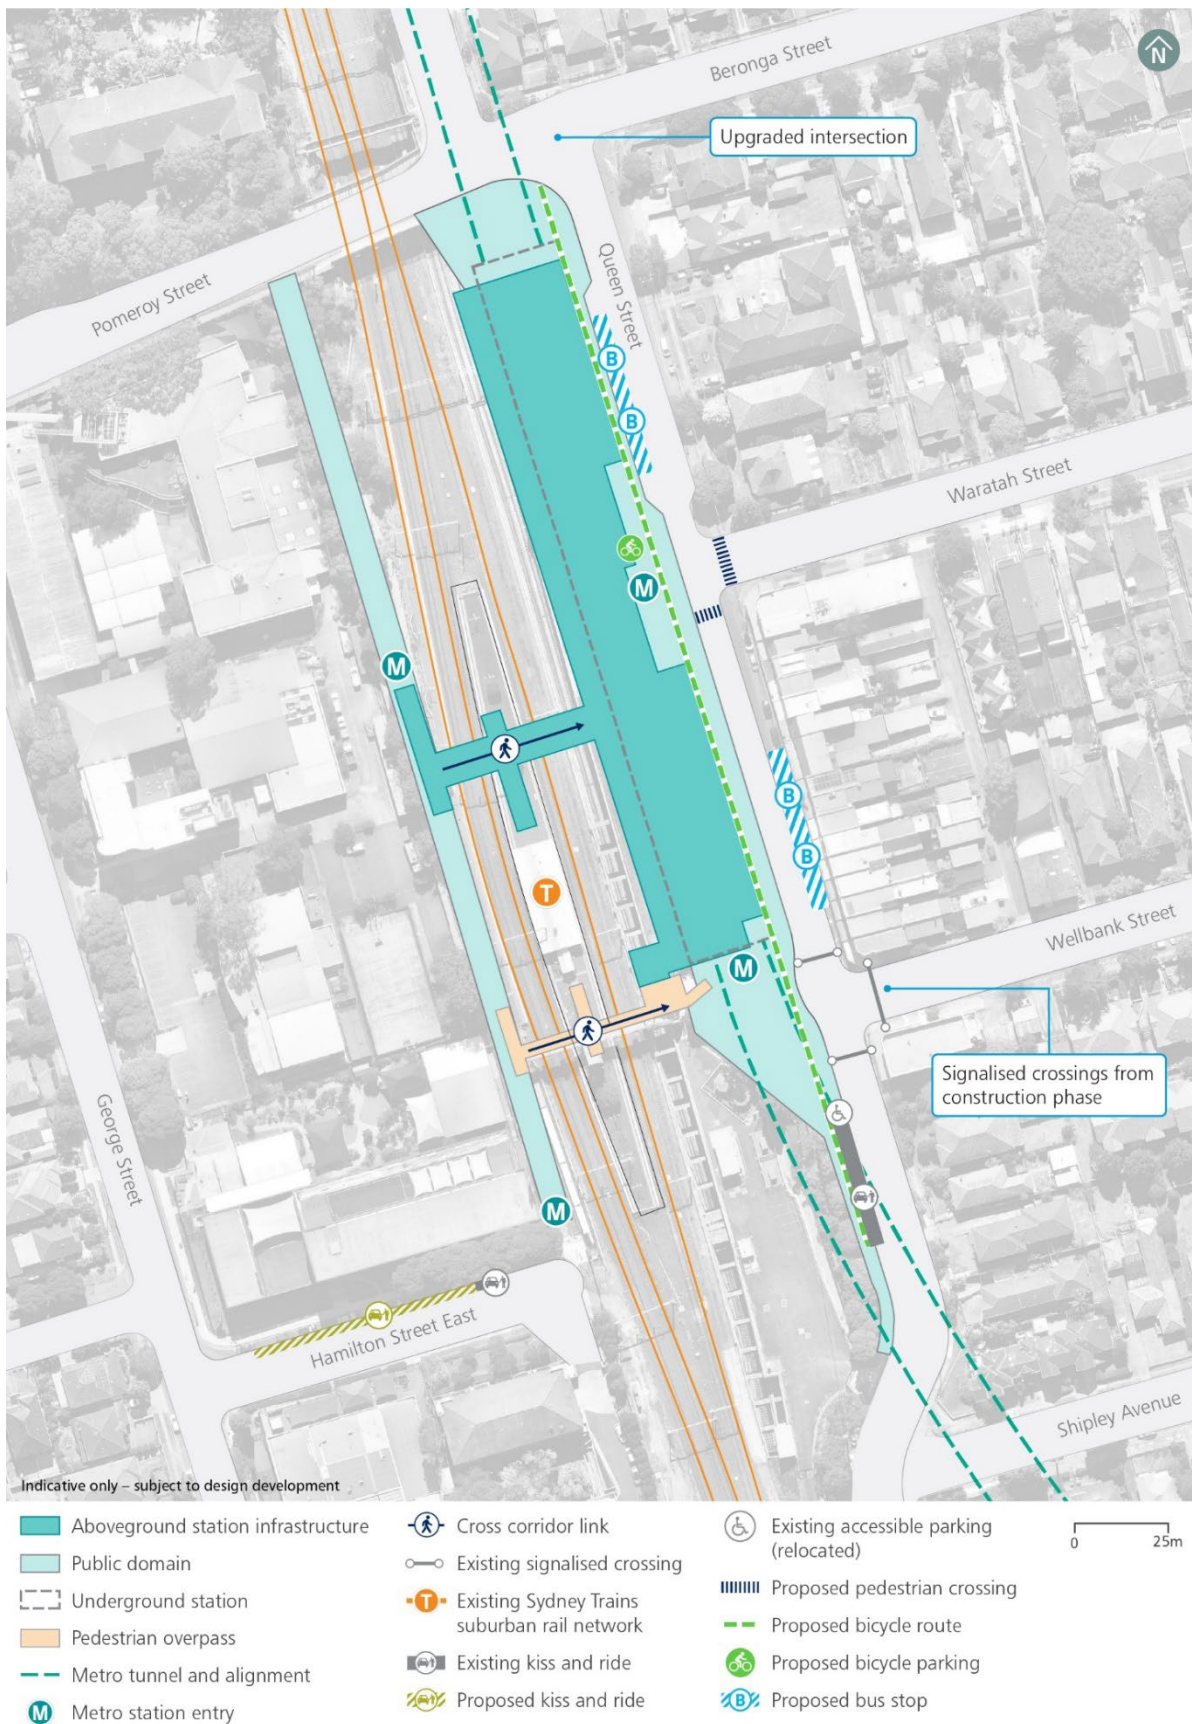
Indicative layout and key design elements – North Strathfield metro station
